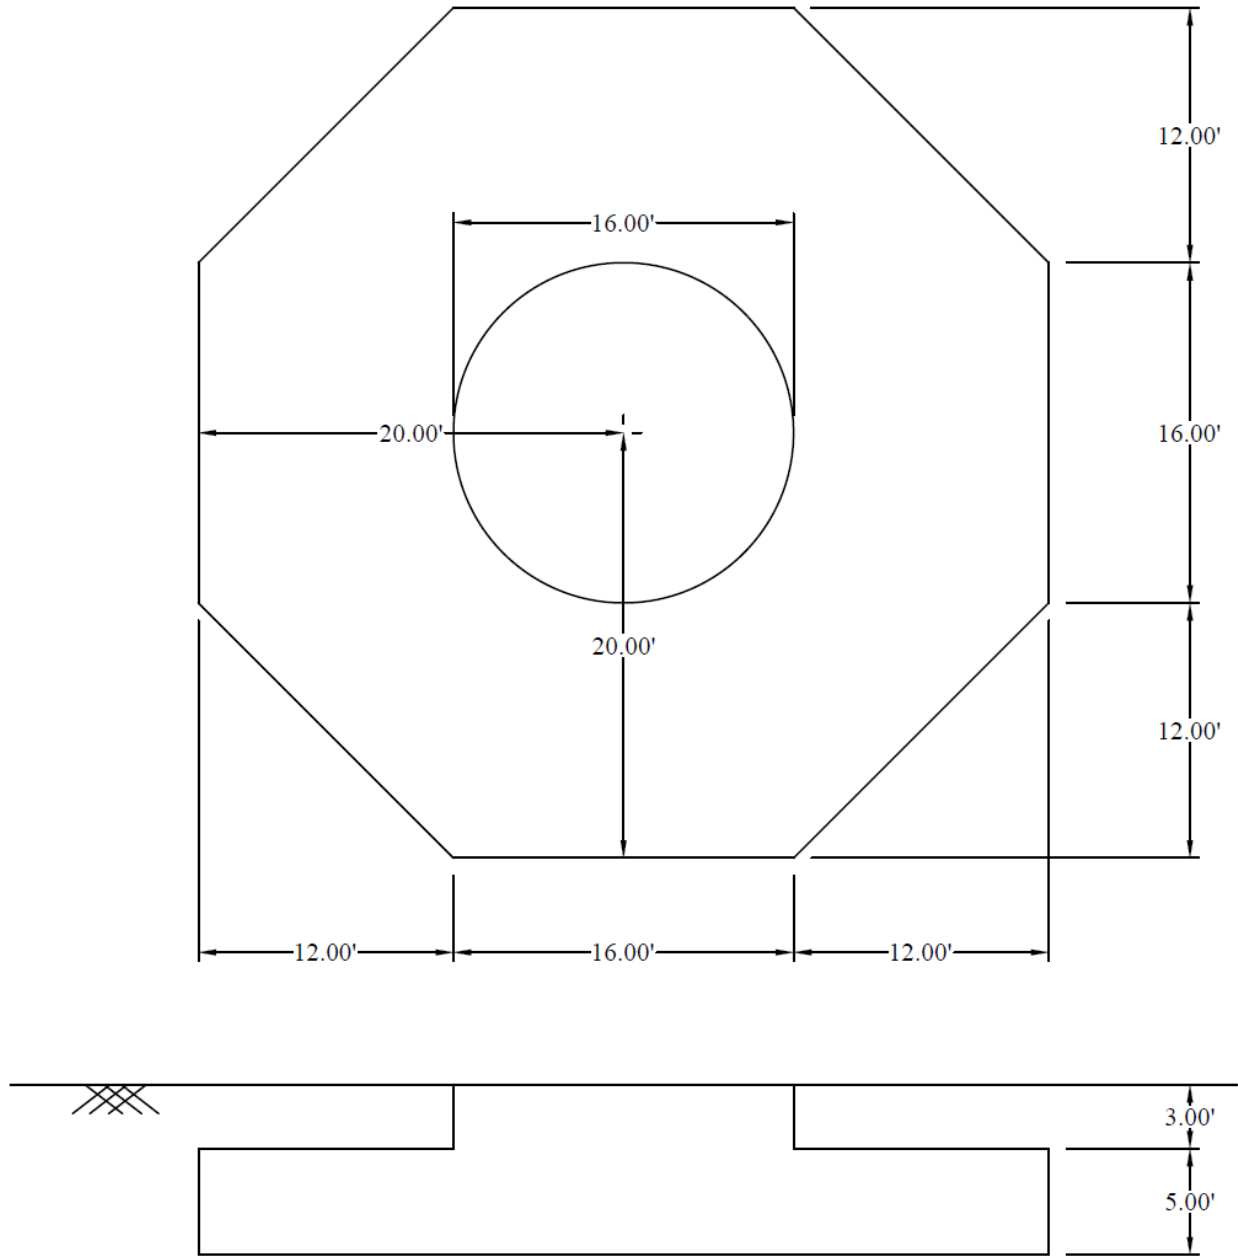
Wind Turbine Tower Concrete Foundation Layout
